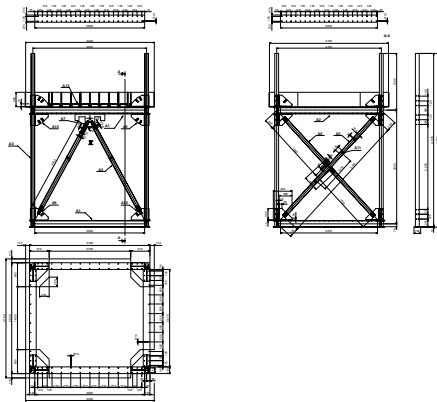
Longitudinal, transversal view and plan of the S.D.o.F. specimen
